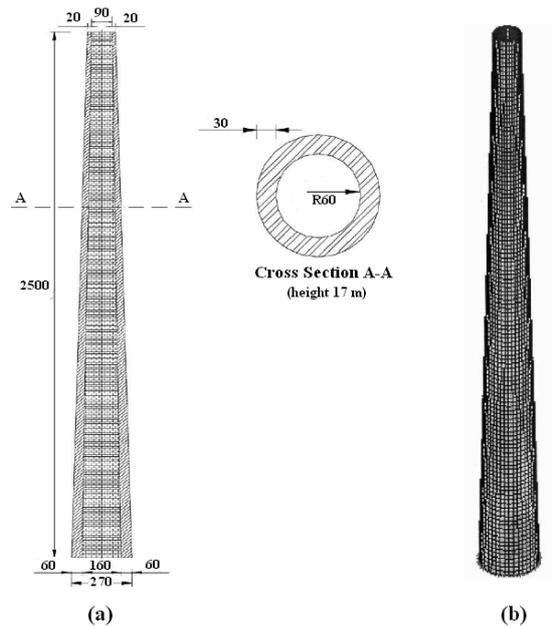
Studied masonry chimney; (a) longitudinal section and cross-section at 17m high, (b) finite element model
